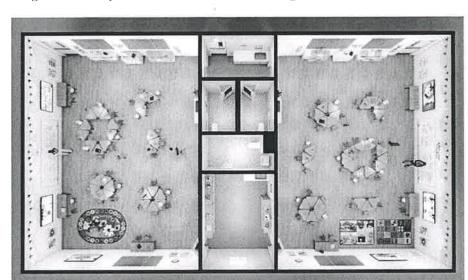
Sample Preschool, TK and Kindergarten Classroom Floor Plan
